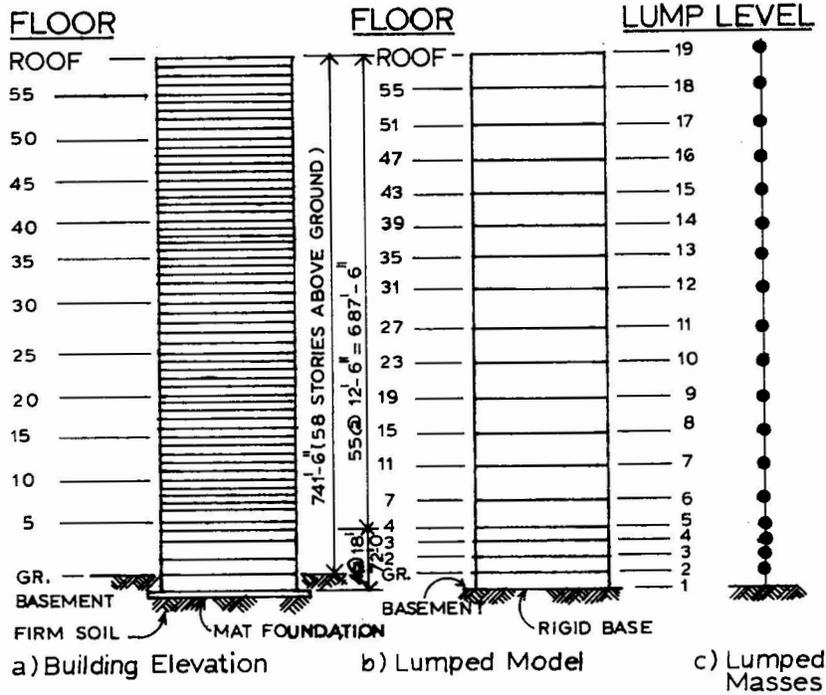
Building Idealizations (1 in. = 25.4mm; 1 ft. = 0.305m)
